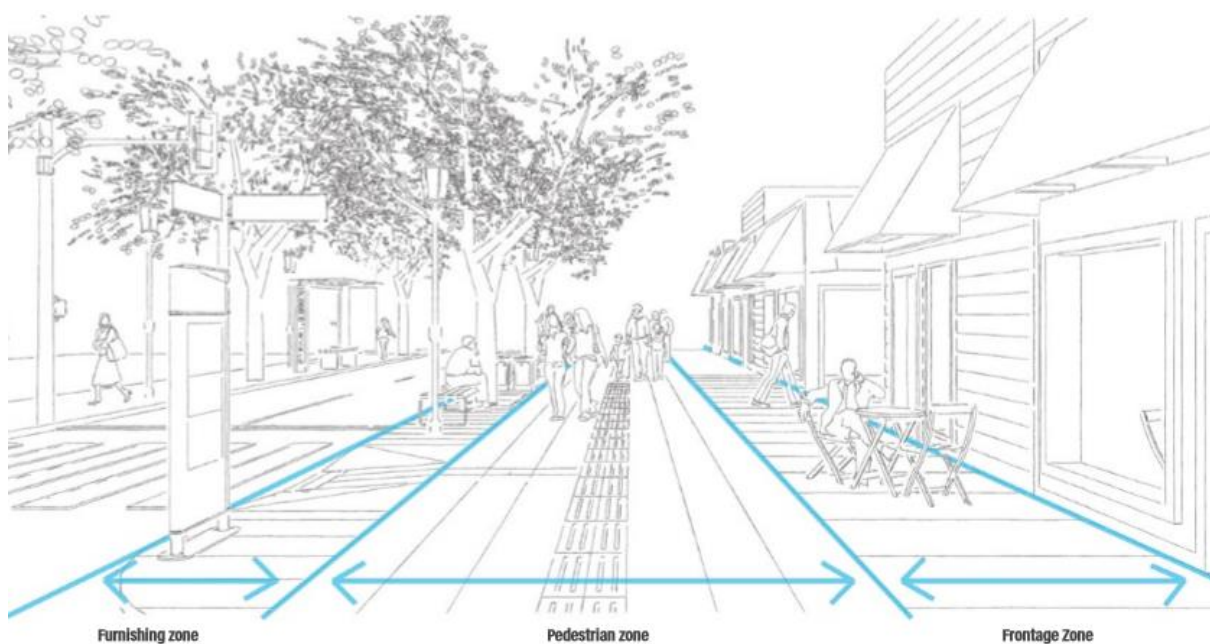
Zones of Sidewalk Corridor (The 8 principles of sidewalks, 2019)
